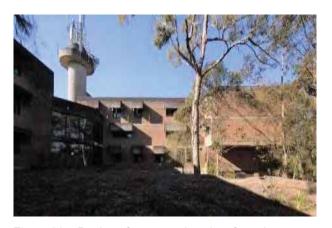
Portion of western elevation, featuring precast concrete window hoods
